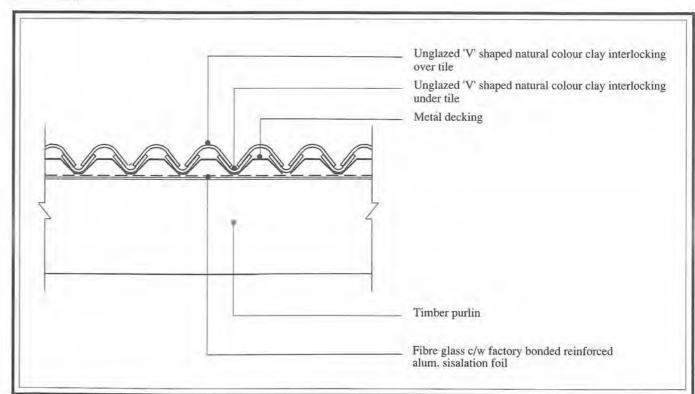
The use of the metal decking roof with insulation and ceiling board as a finish in a typical shophouse.
